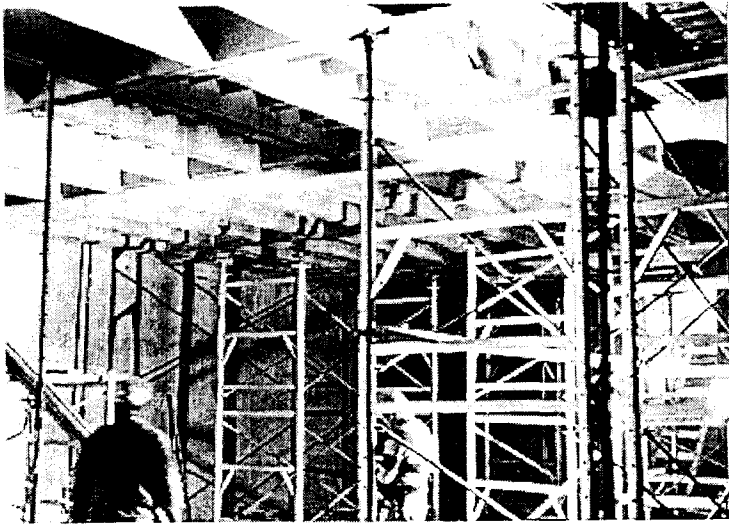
Shoring at the East Ave. Library Storage Facility.
